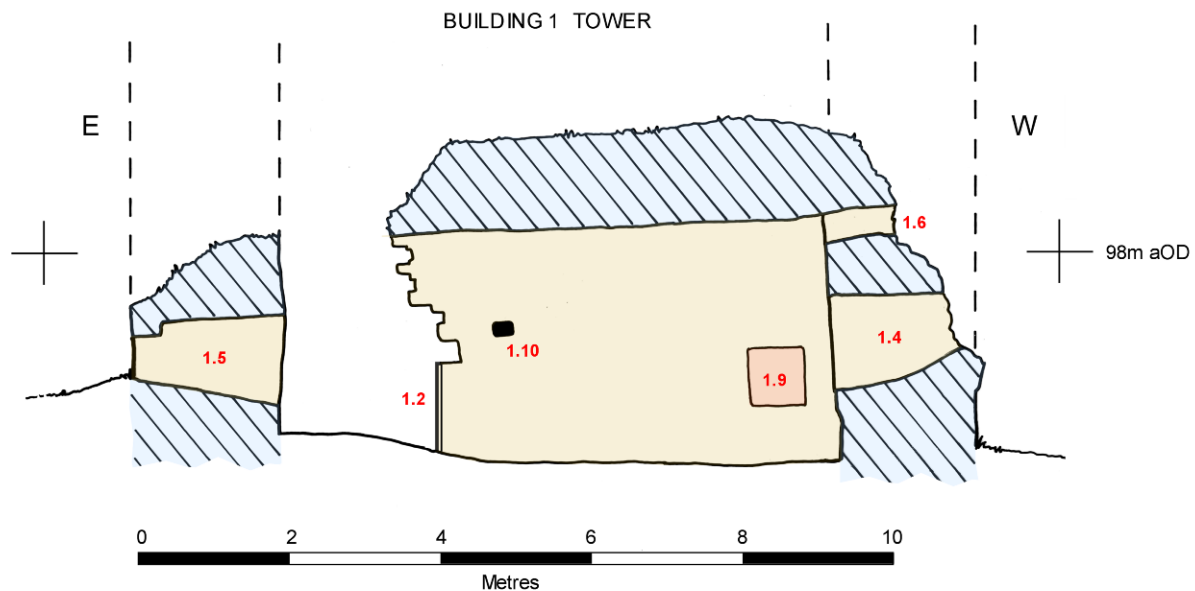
Longitudinal east-west section through the Tower House. Section B on figure 4 (1:100)
